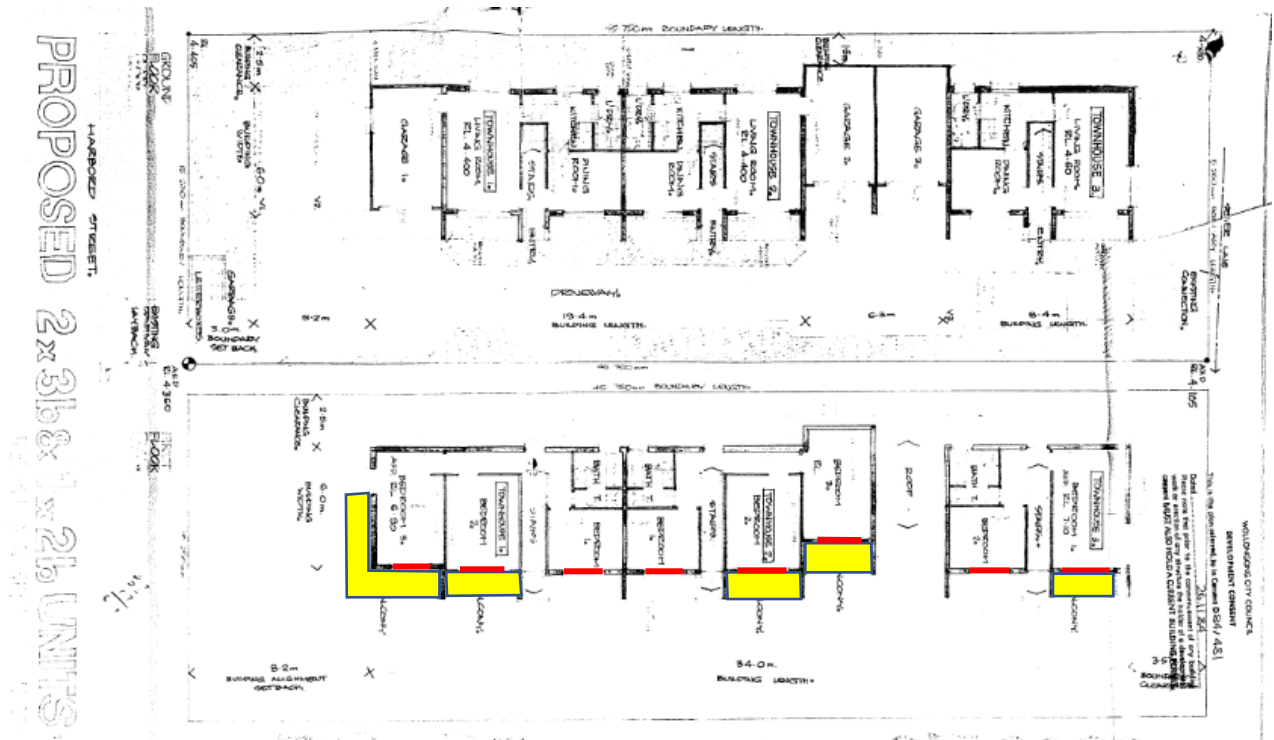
No. 21 Harbord St - Approved Floor Plans – Upper level balconies marked in Yellow, bedroom windows in red
